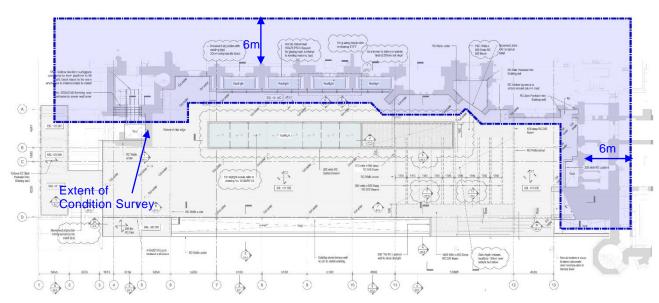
Ground Floor Plan showing Extent of Condition Survey
